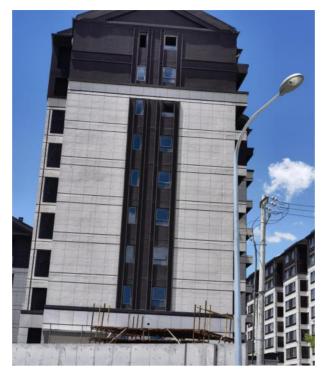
Swelling and cracking of horizontal glue joints on the façade
